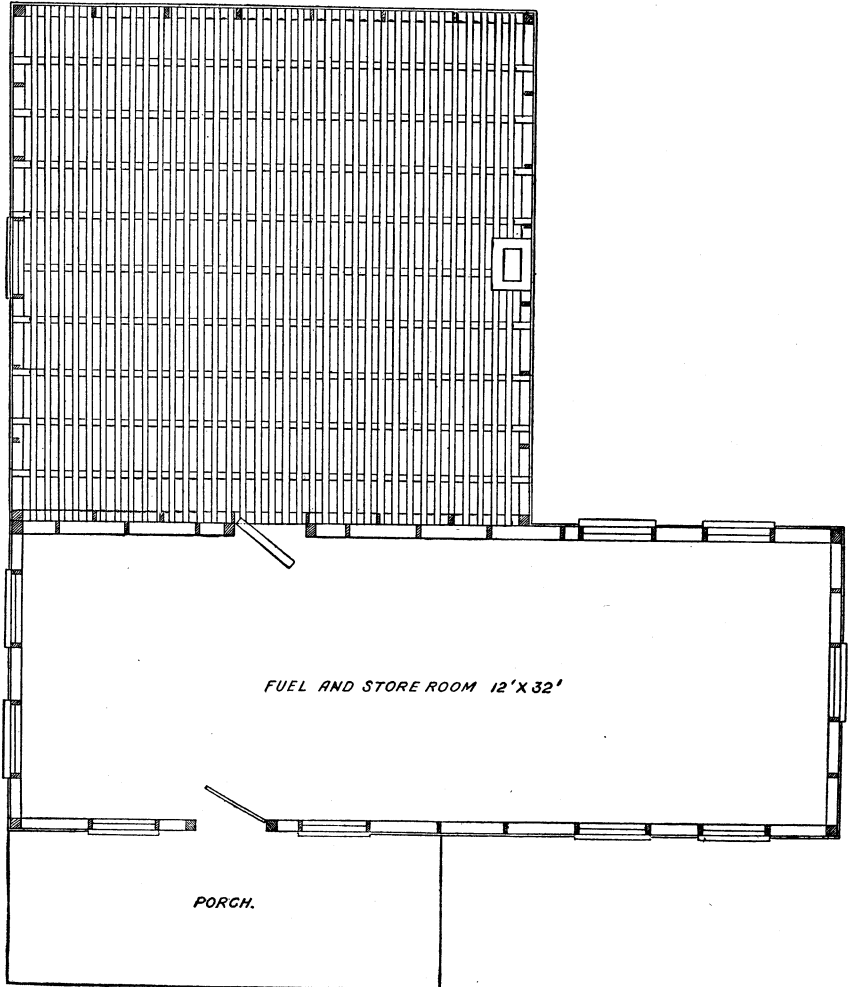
Second or dry-room floor of a hop-kiln evaporator.
